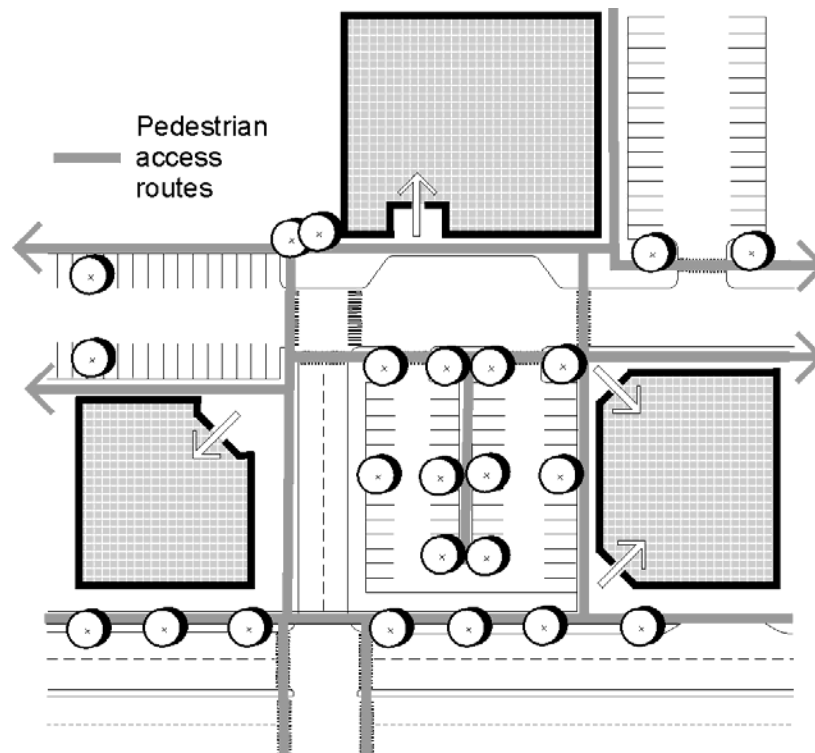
Internal walkway standards and an example along retail or mixed-use buildings
